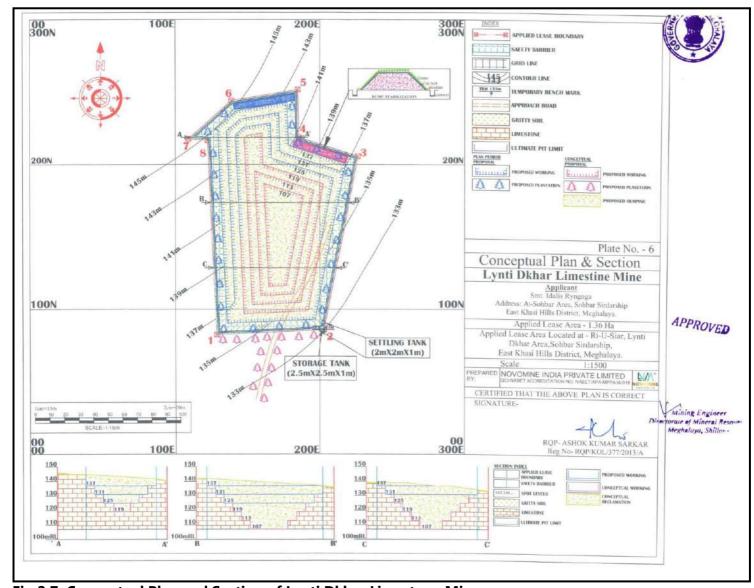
Conceptual Plan and Section of Lynti Dkhar Limestone Mine
